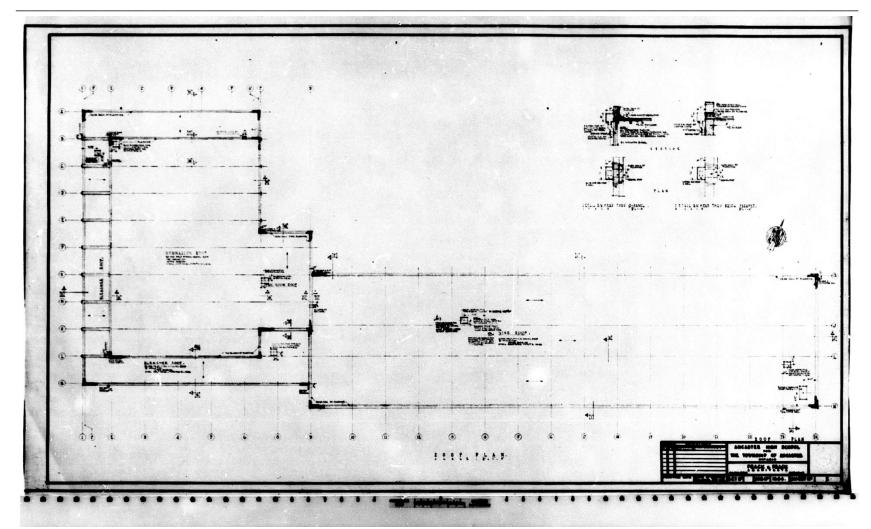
Ancaster High – Prack & Prack Roof Plan (Slide 41-7: Provided by Hamilton Wentworth District School Board Archives)
